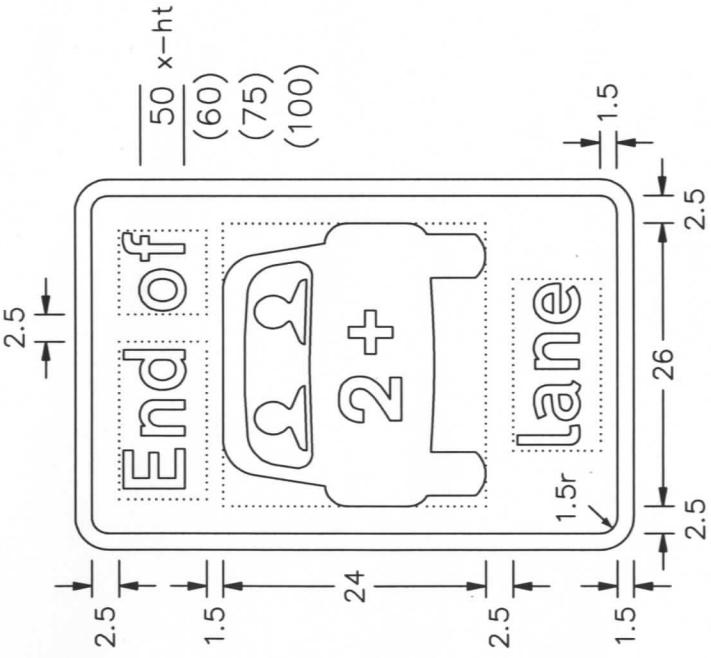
Related Drawings NS 66 sheet 1
